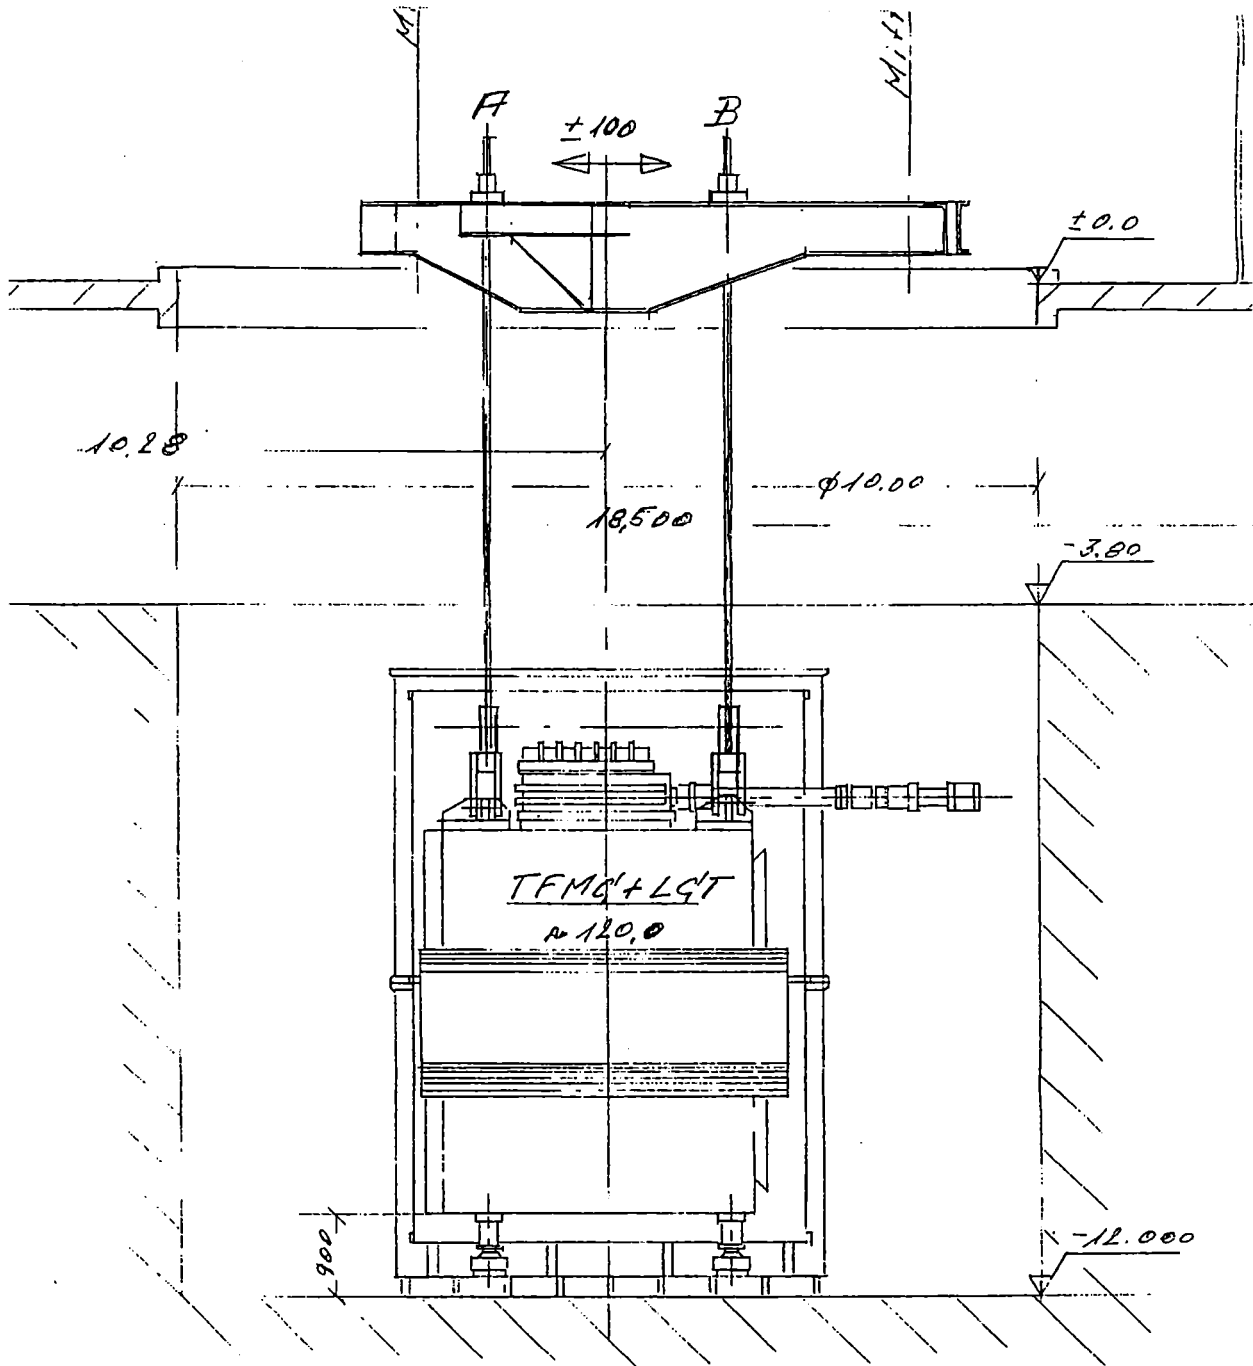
The TFMG test configuration hanging on the lifting gear carried by the 50 t and 80 t cranes.
